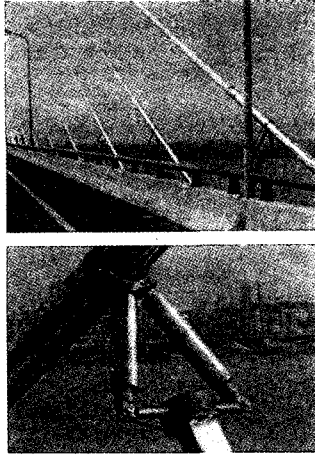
MR damper installation on the Dongting Lake Bridge, Hunan, China<sup>22)</sup>
